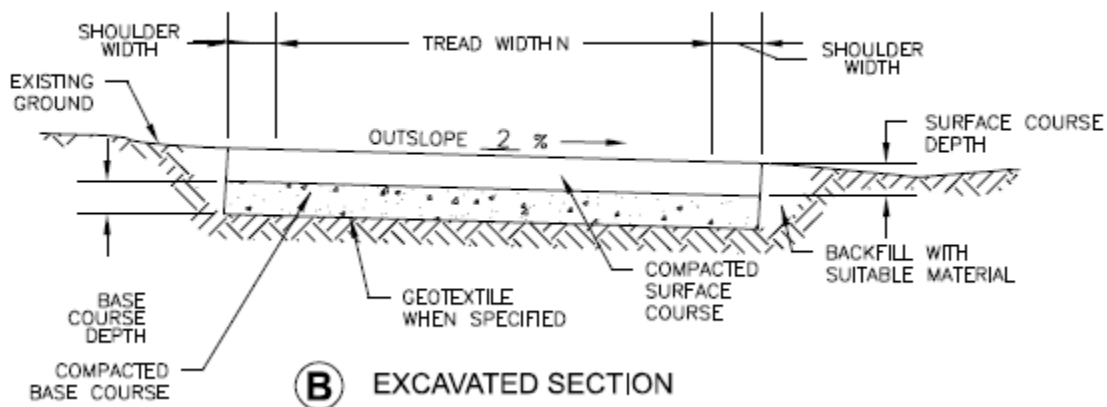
Typical section for resurfaced trail by USFS standards (B: Excavated Section contrasts with an outsloped or raised section, as shown in the appendices).
